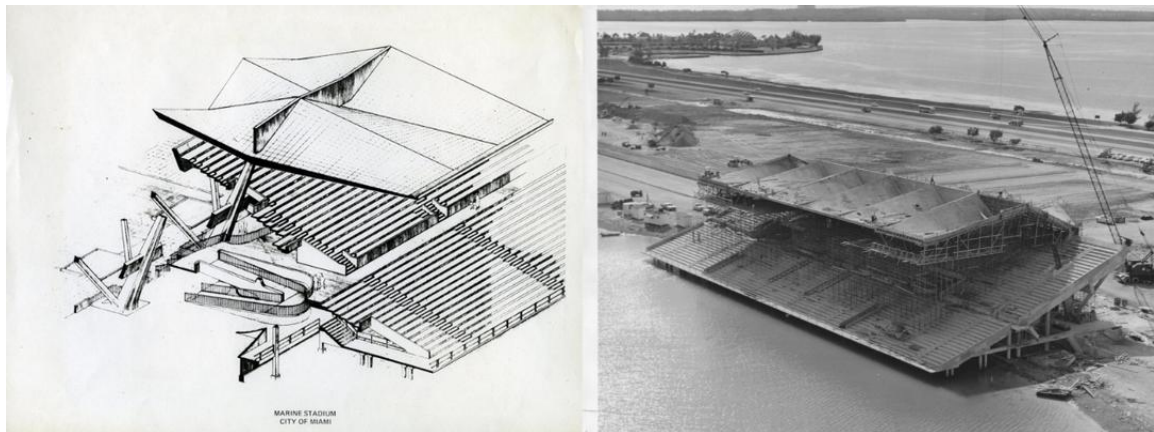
Section drawing of stadium on the left, showing various structural elements. A photo taken during construction on the right, showing the reused formwork. Images courtesy of *Friends of Miami Marine Stadium*.
